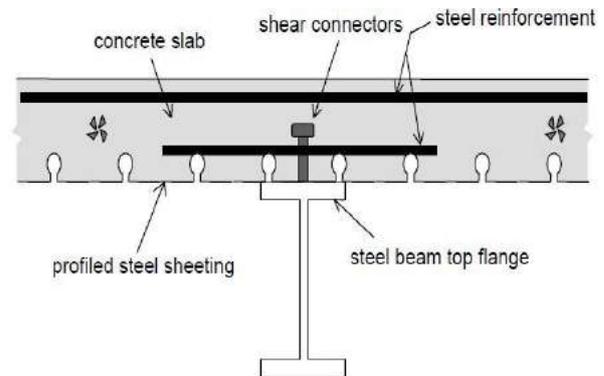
Shear connectors between concrete slabs and steel beams in a composite beam
